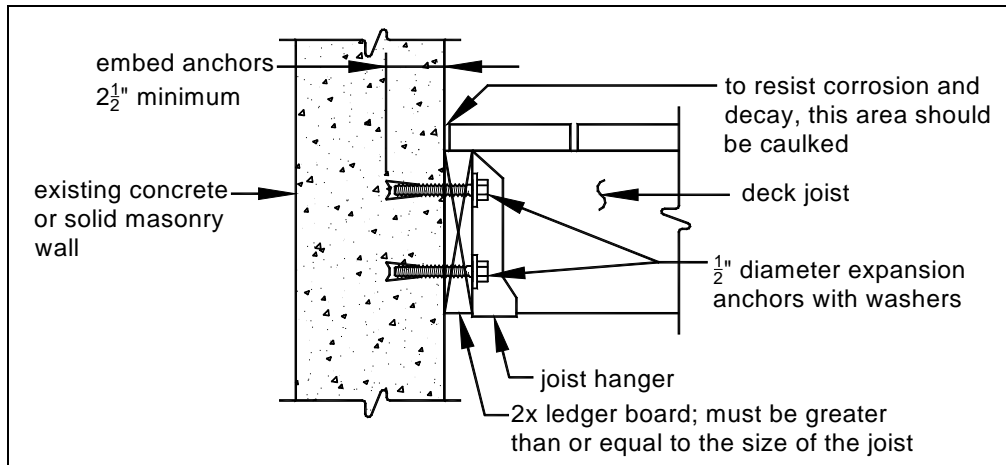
ATTACHMENT OF LEDGER BOARD-TO-FOUNDATION WALL (CONCRETE OR SOLID MASONRY)
